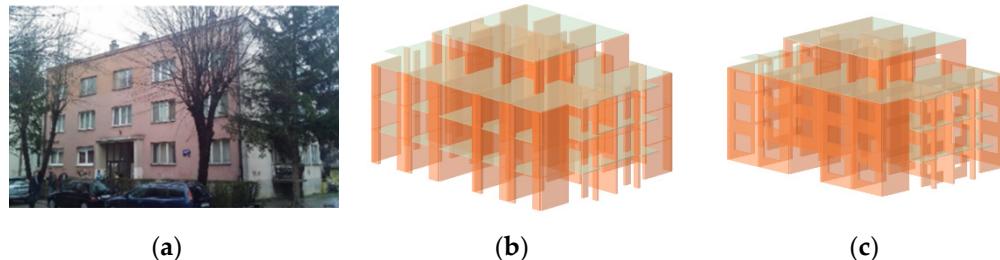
3D numerical models: (a) actual building; (b) Cantilever model, and (c) Equivalent Frame Model (EFM).
